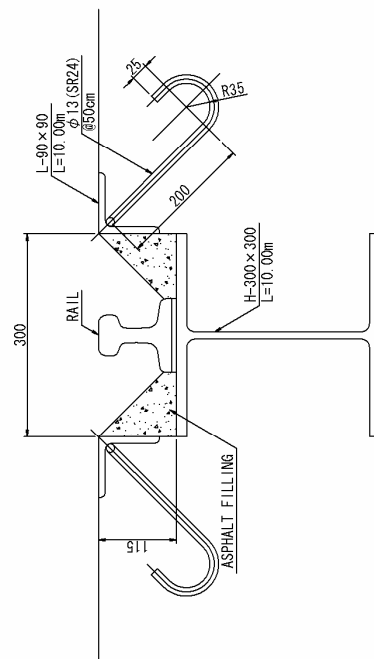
(12) Railway Foundation Structure in Port of Lobito
